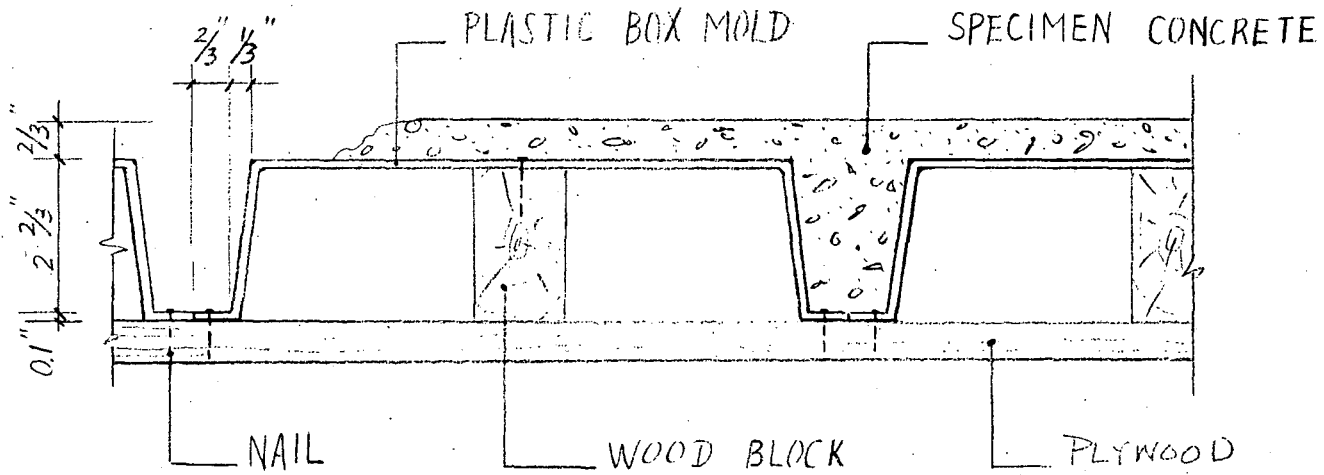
The Formwork For Waffle Dome (1"=25.4 mm)
